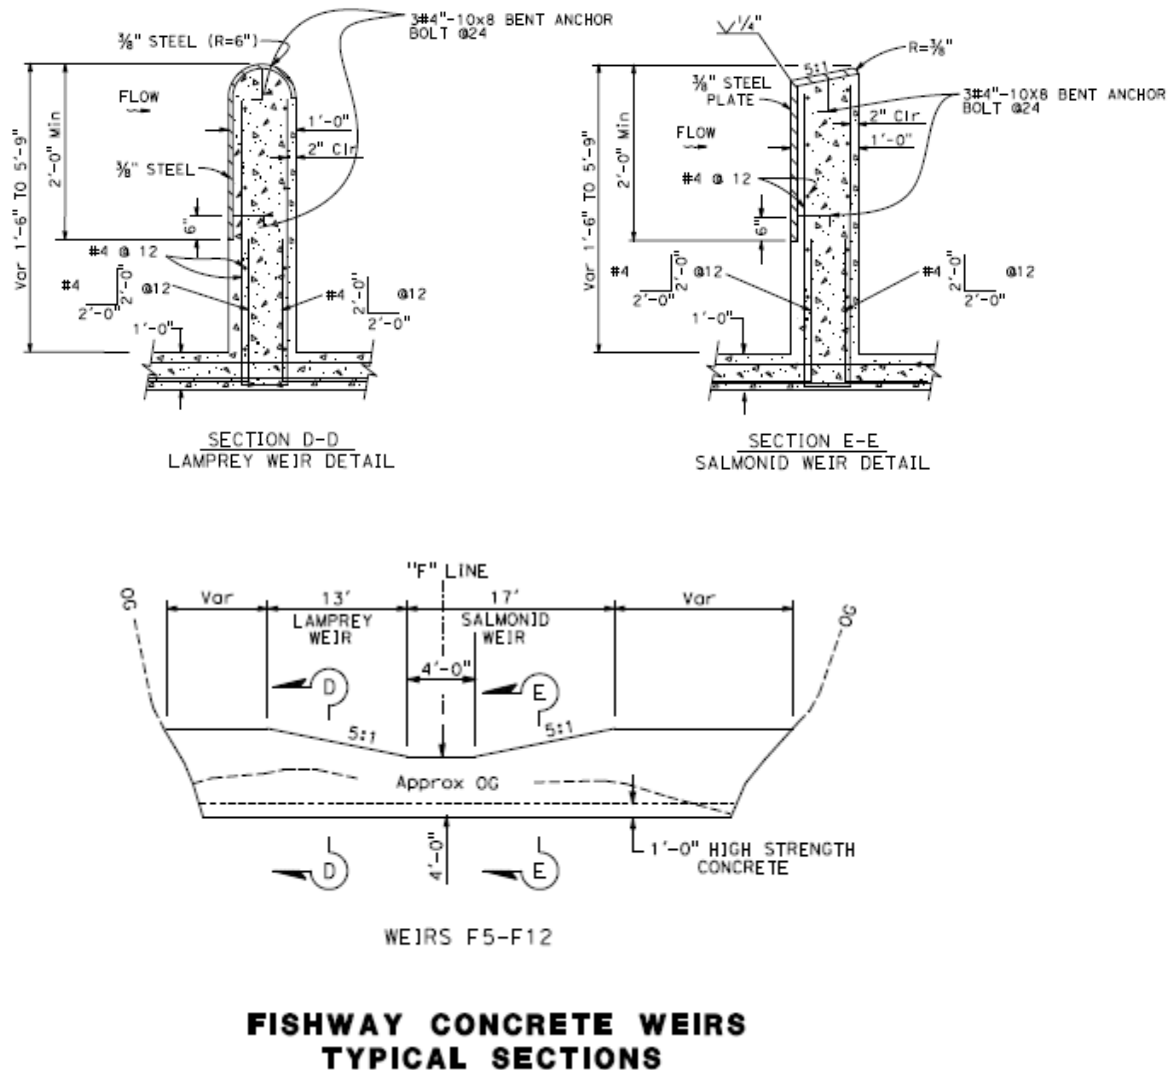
Design typical of profile and elevation of lamprey and salmonid fishway concrete weirs.
